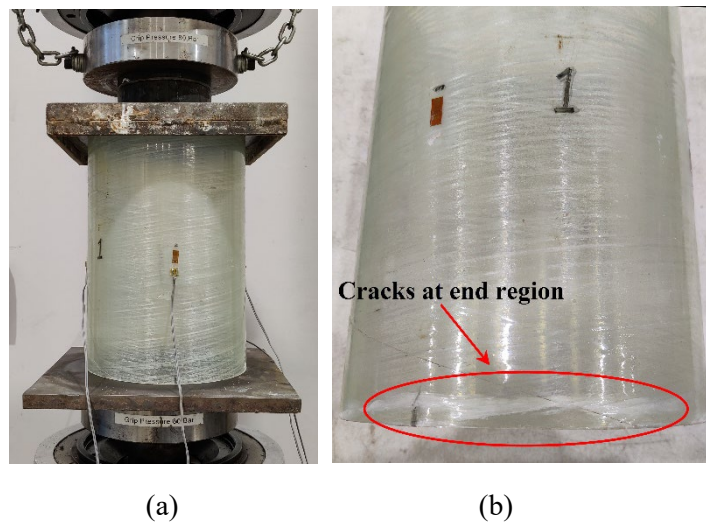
Compression test of hollow FRP tubes: (a) test setup; (b) typical failure mode.
